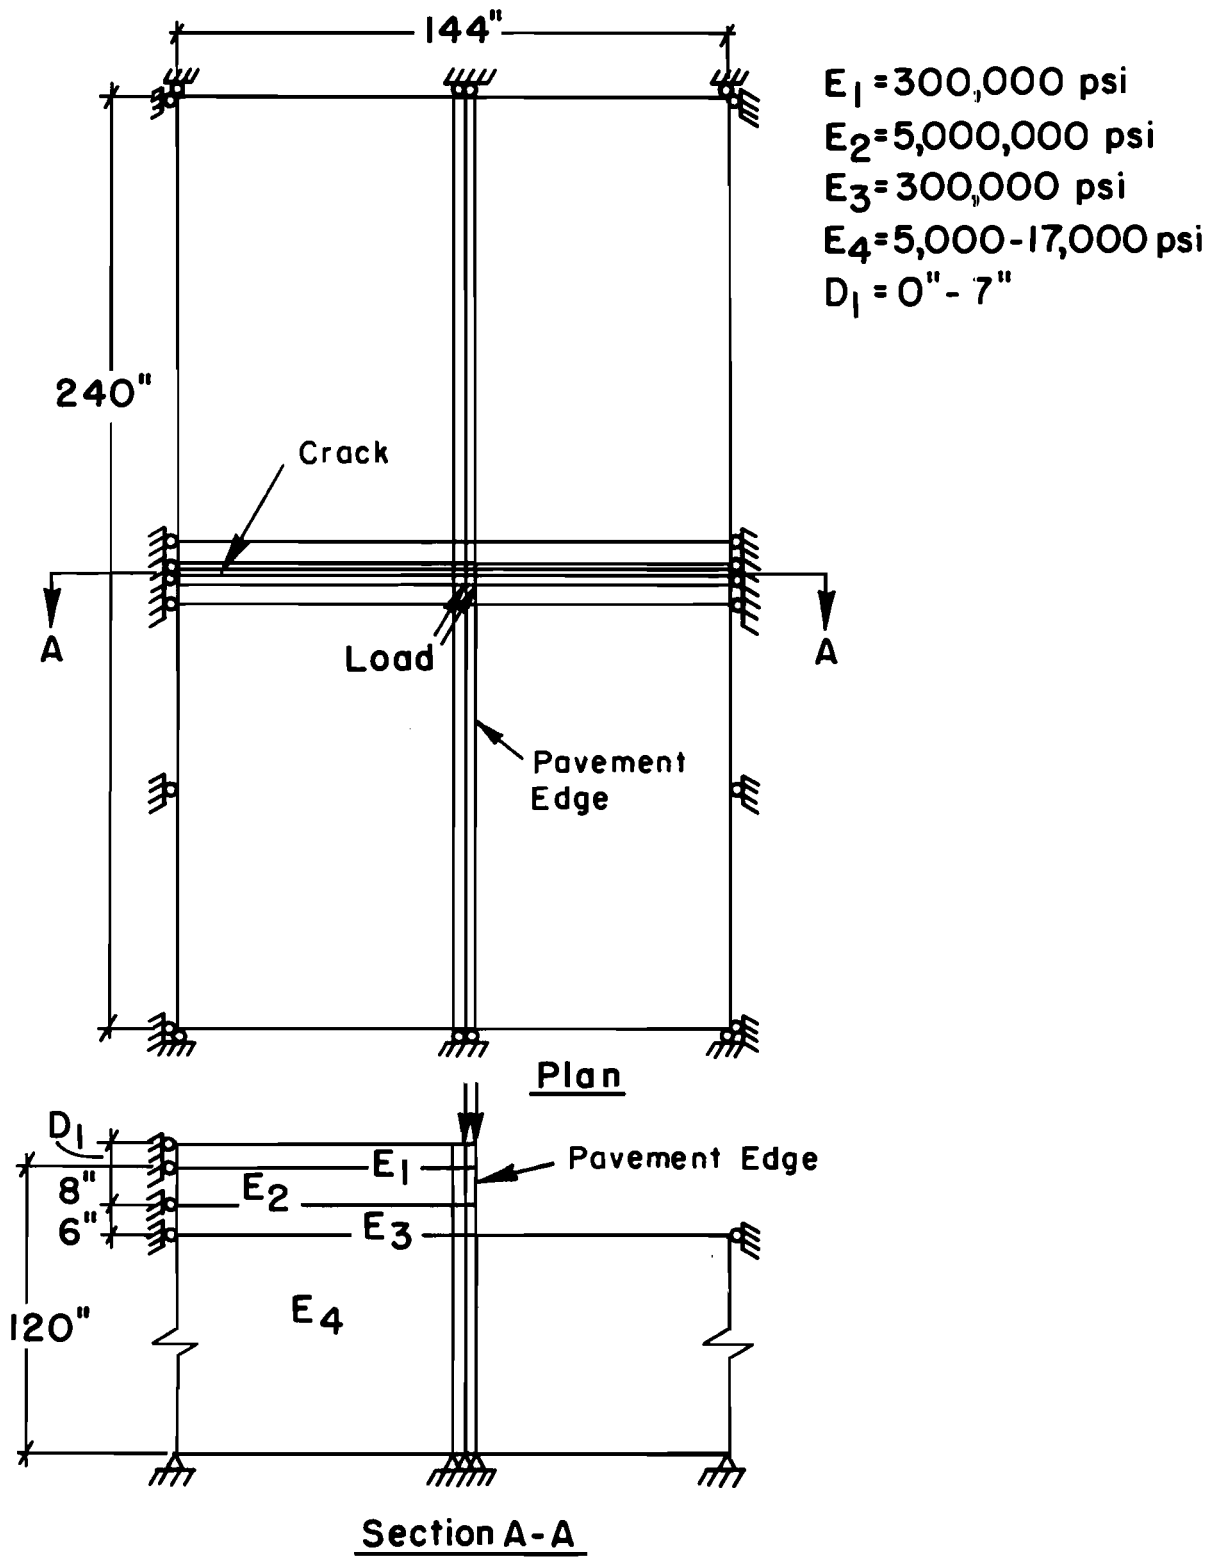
Finite element configuration for computing reflection stresses in an asphalt overlay on rigid pavement.
